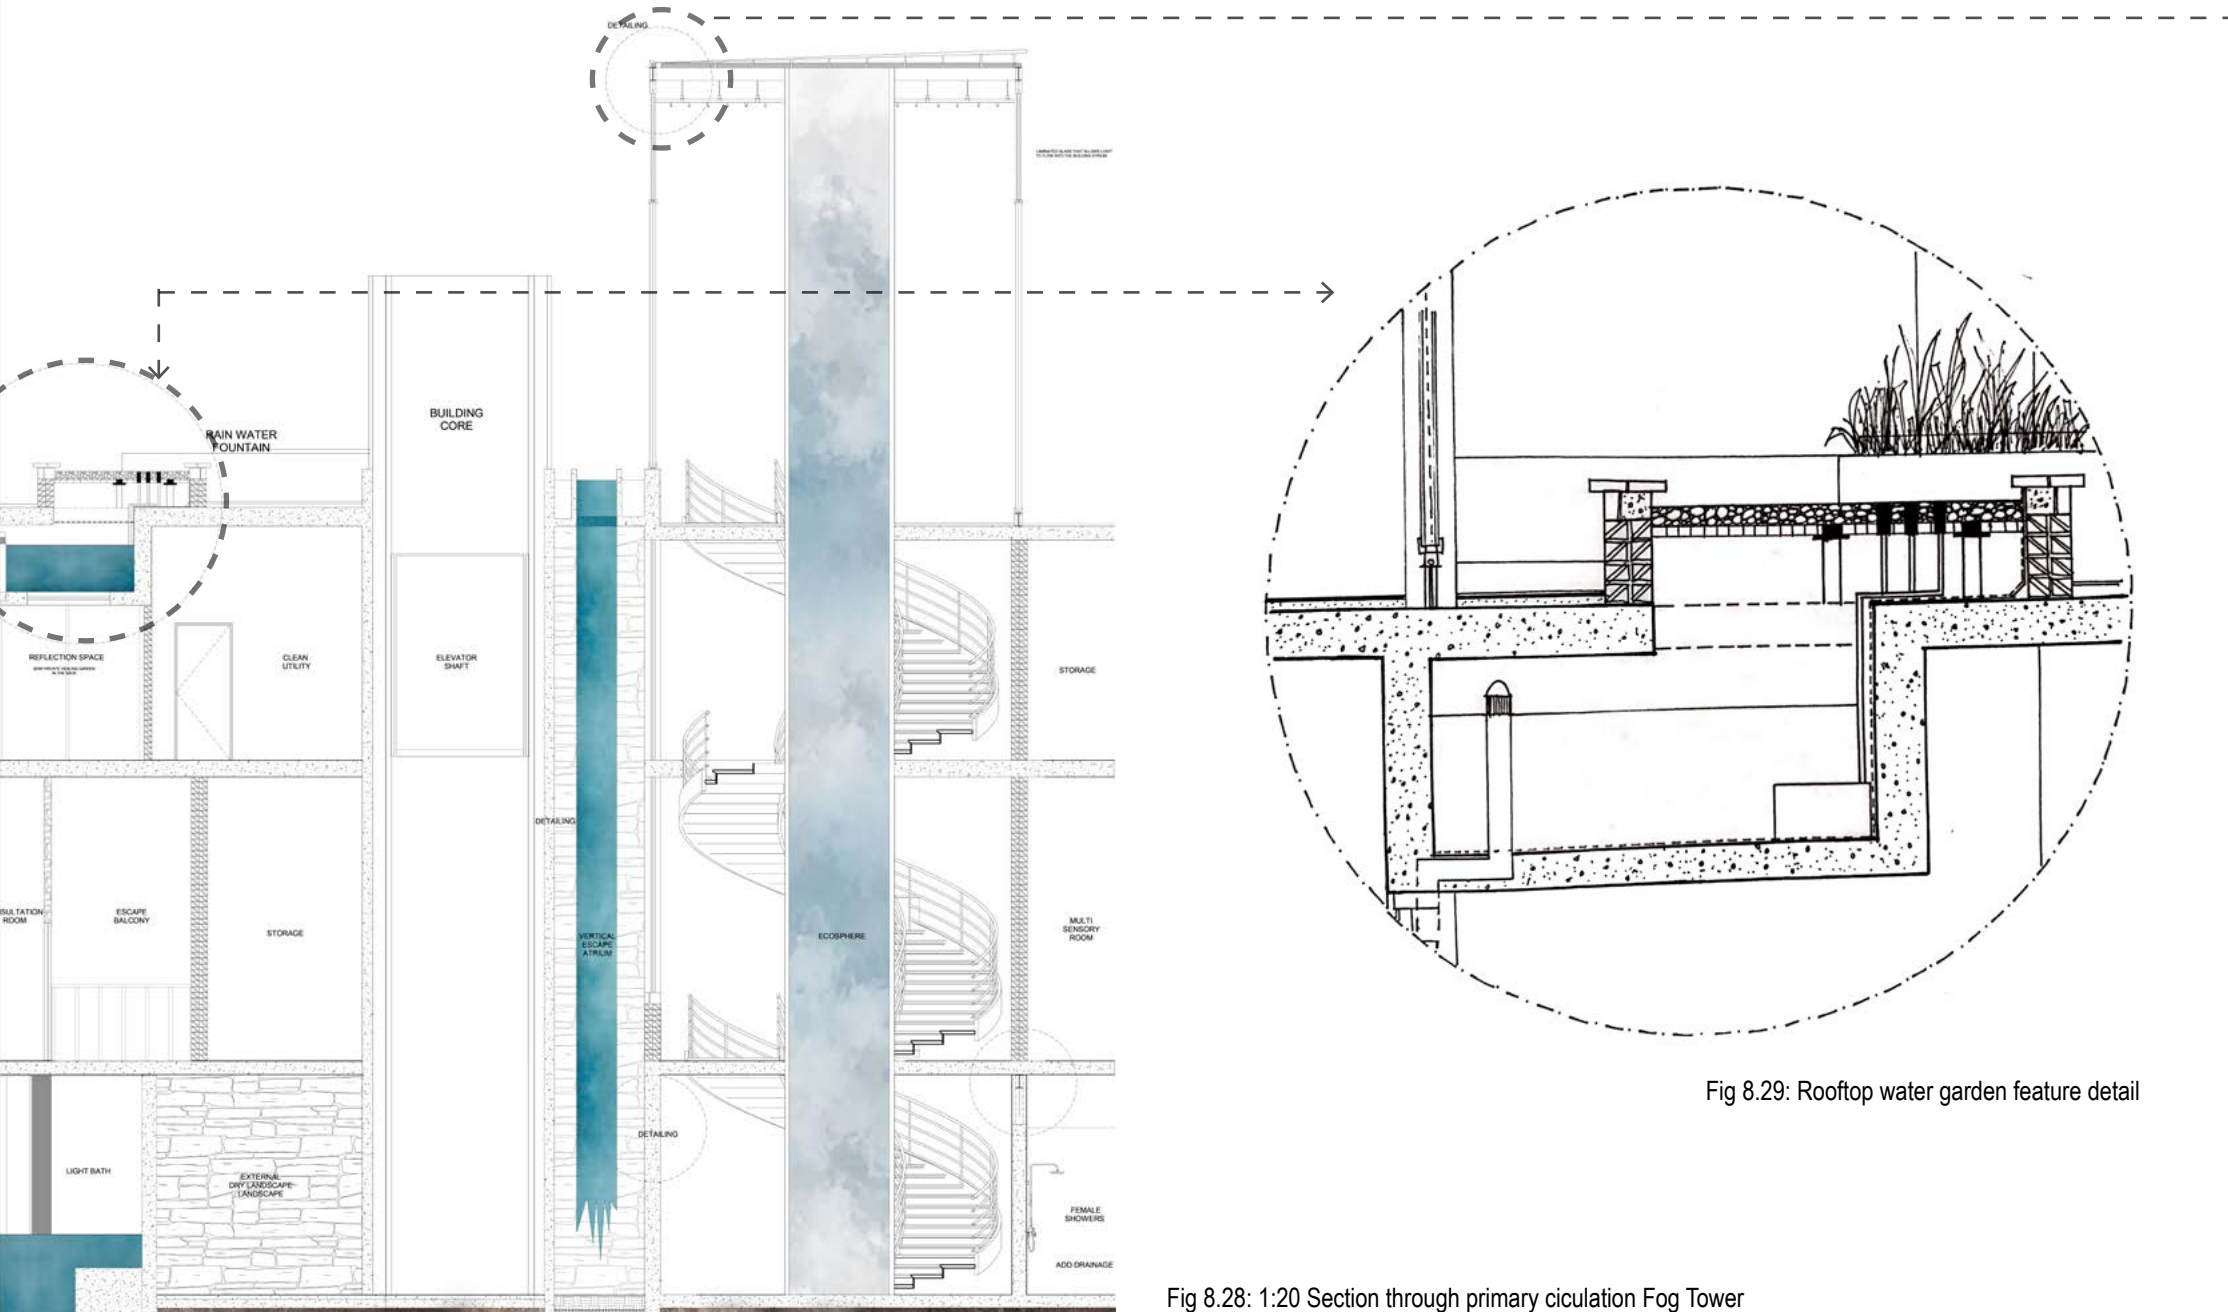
1:20 Section through primary circulation Fog Tower
